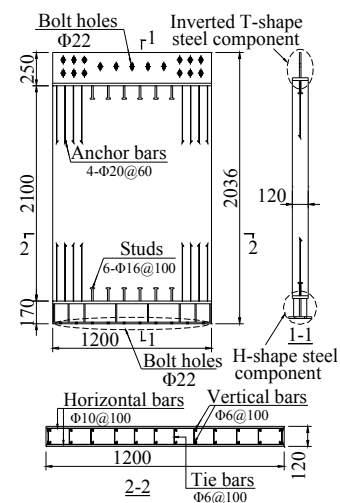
Details of replaceable RC wall panel (dimensions in mm)
